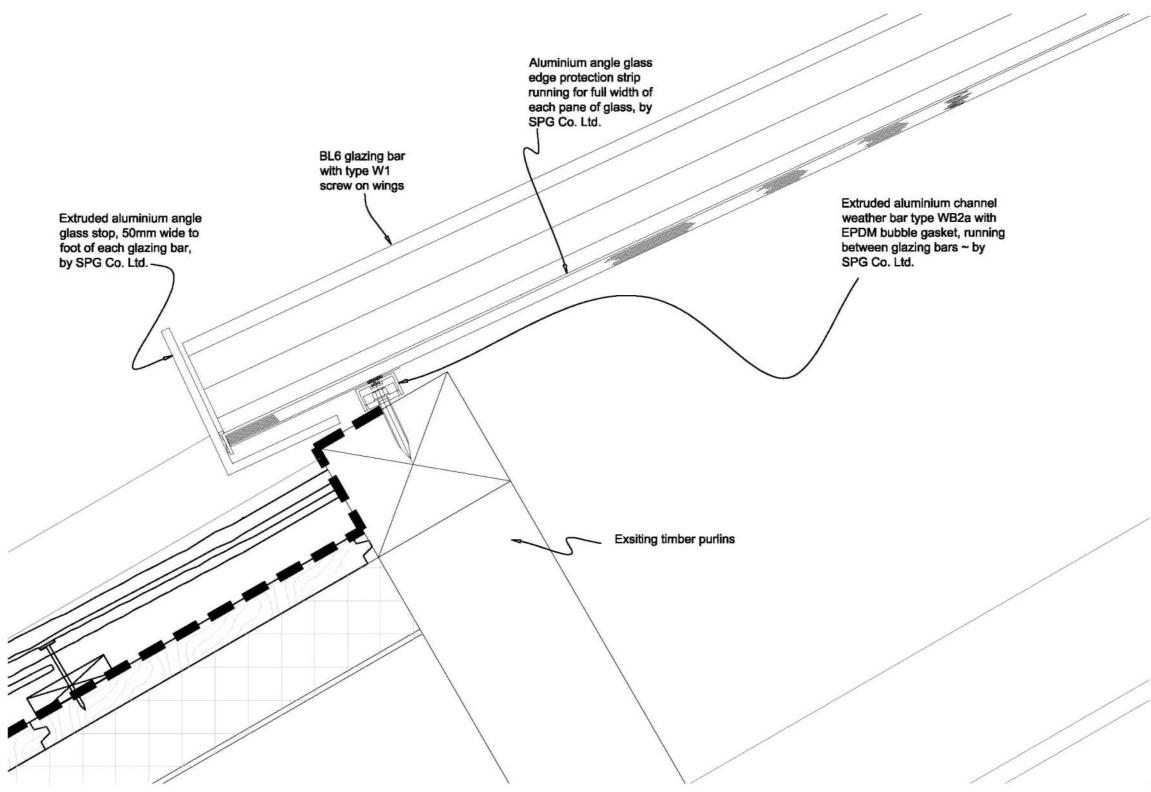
Proposed detail at cill of replacement patent glazing to roofs
